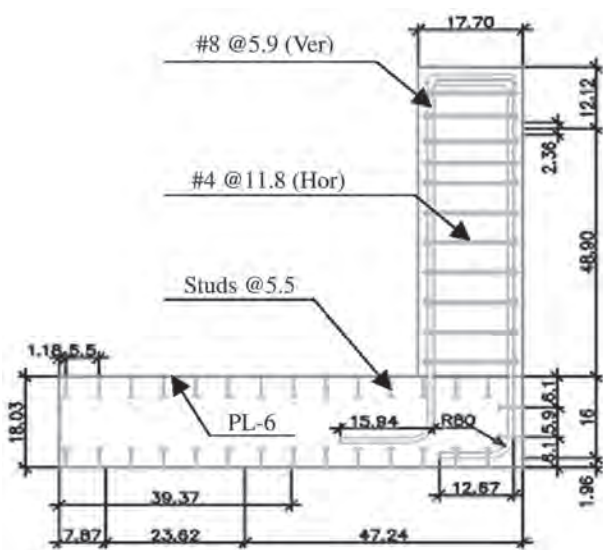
SC wall-to-RC wall noncontact lap splice (L-joint) connection (units: in.) (Hwang et al., 2013).
